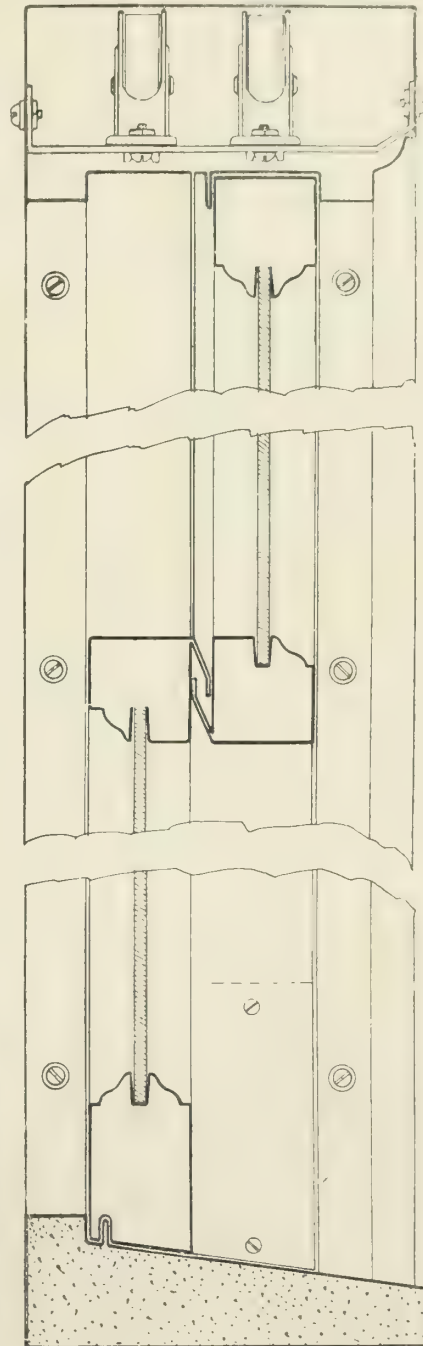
PHOENIX HOLLOW SHEET-METAL FIREPROOF WINDOW FRAME
